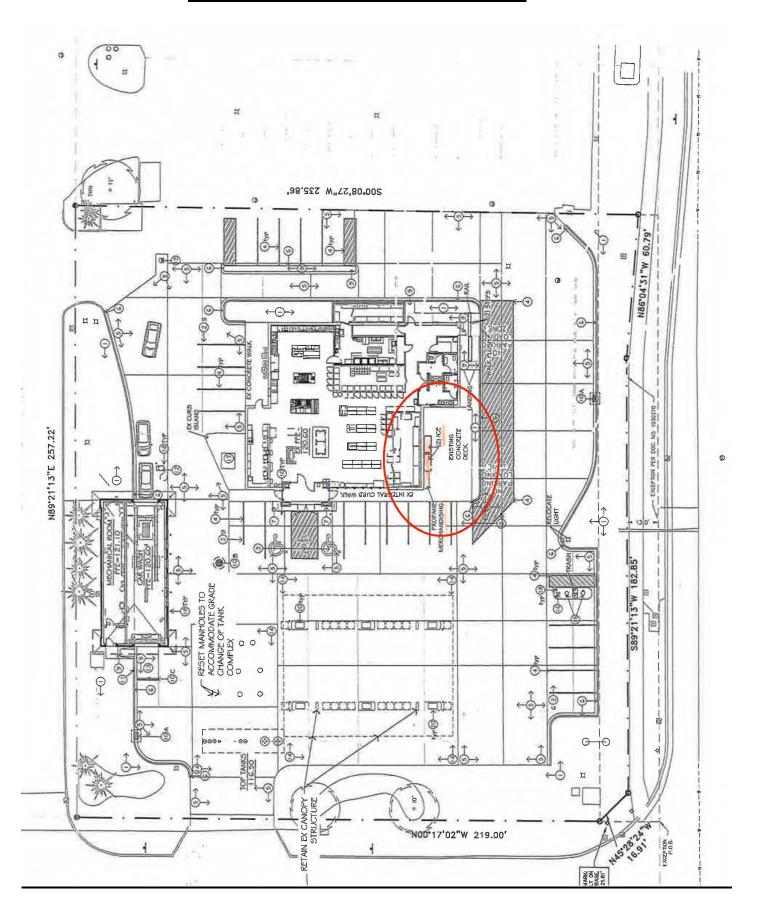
EXHIBIT B: LOCATION OF OUTDOOR STORAGE
